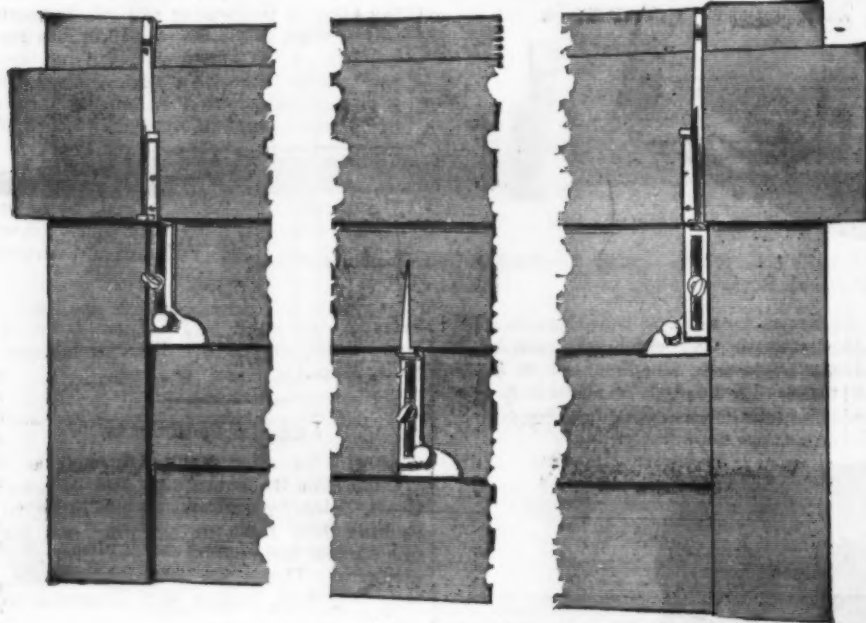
Improved Clapboard Holder, Siding Gauge and Scribe Hook.
